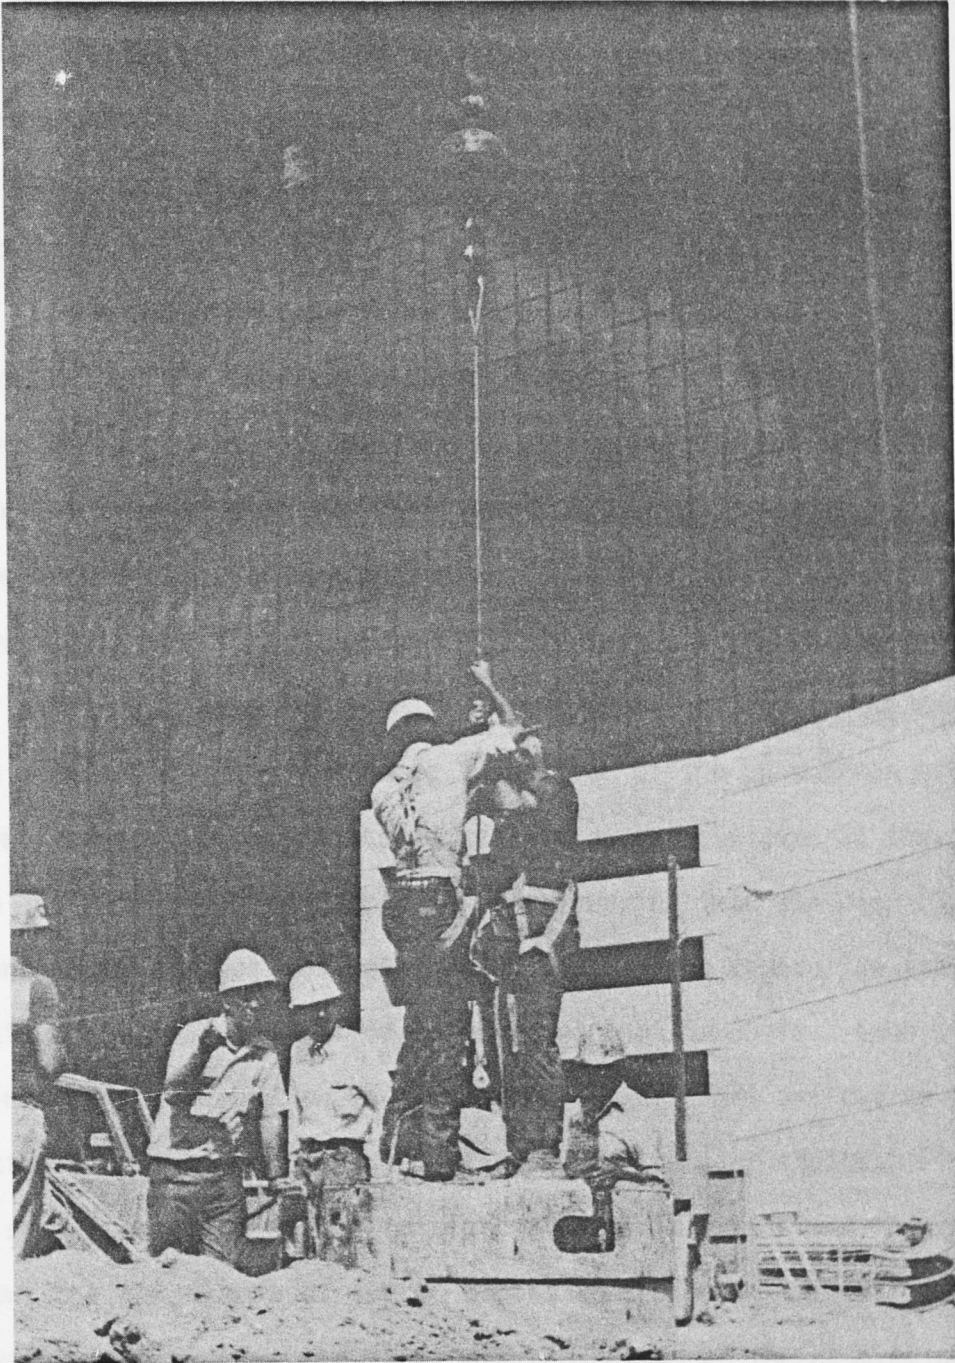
DESCENT INTO SHAFT FOR INSPECTION OF BELL
